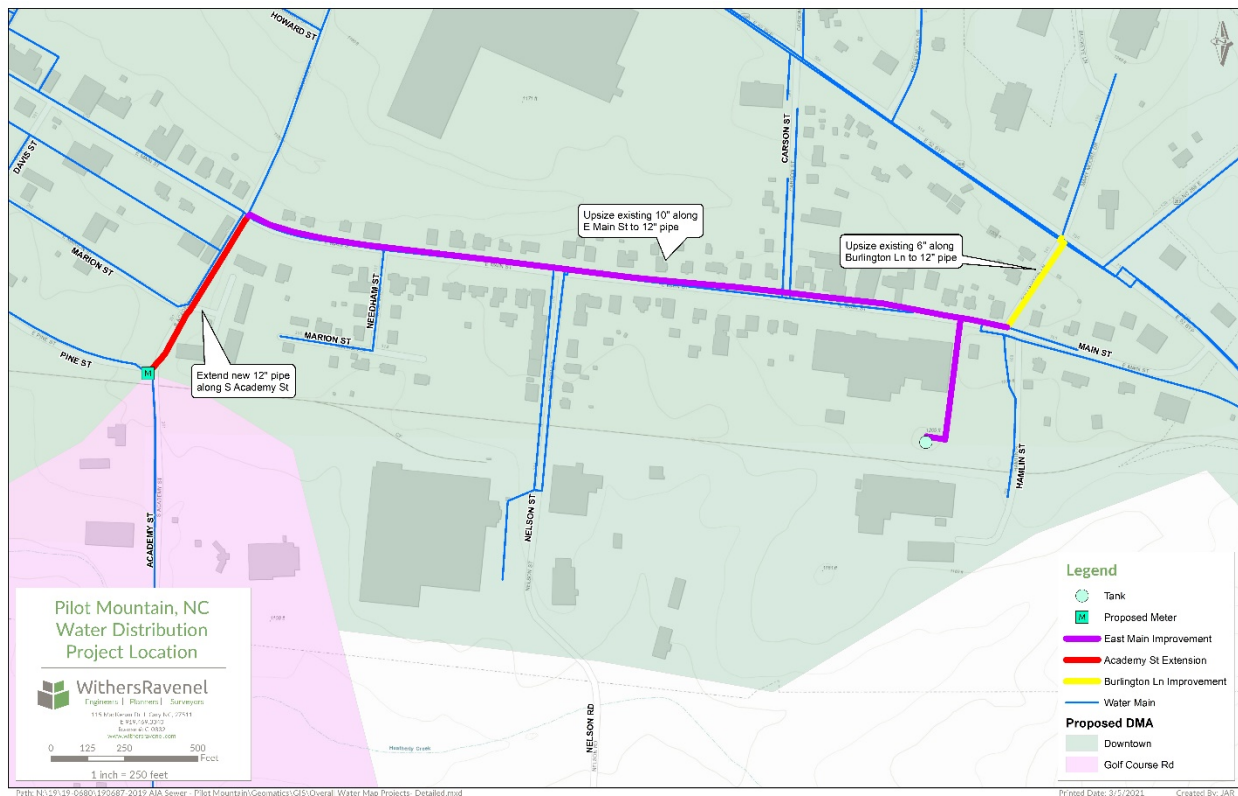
Proposed pipe improvement projects near Pilot Center tank
